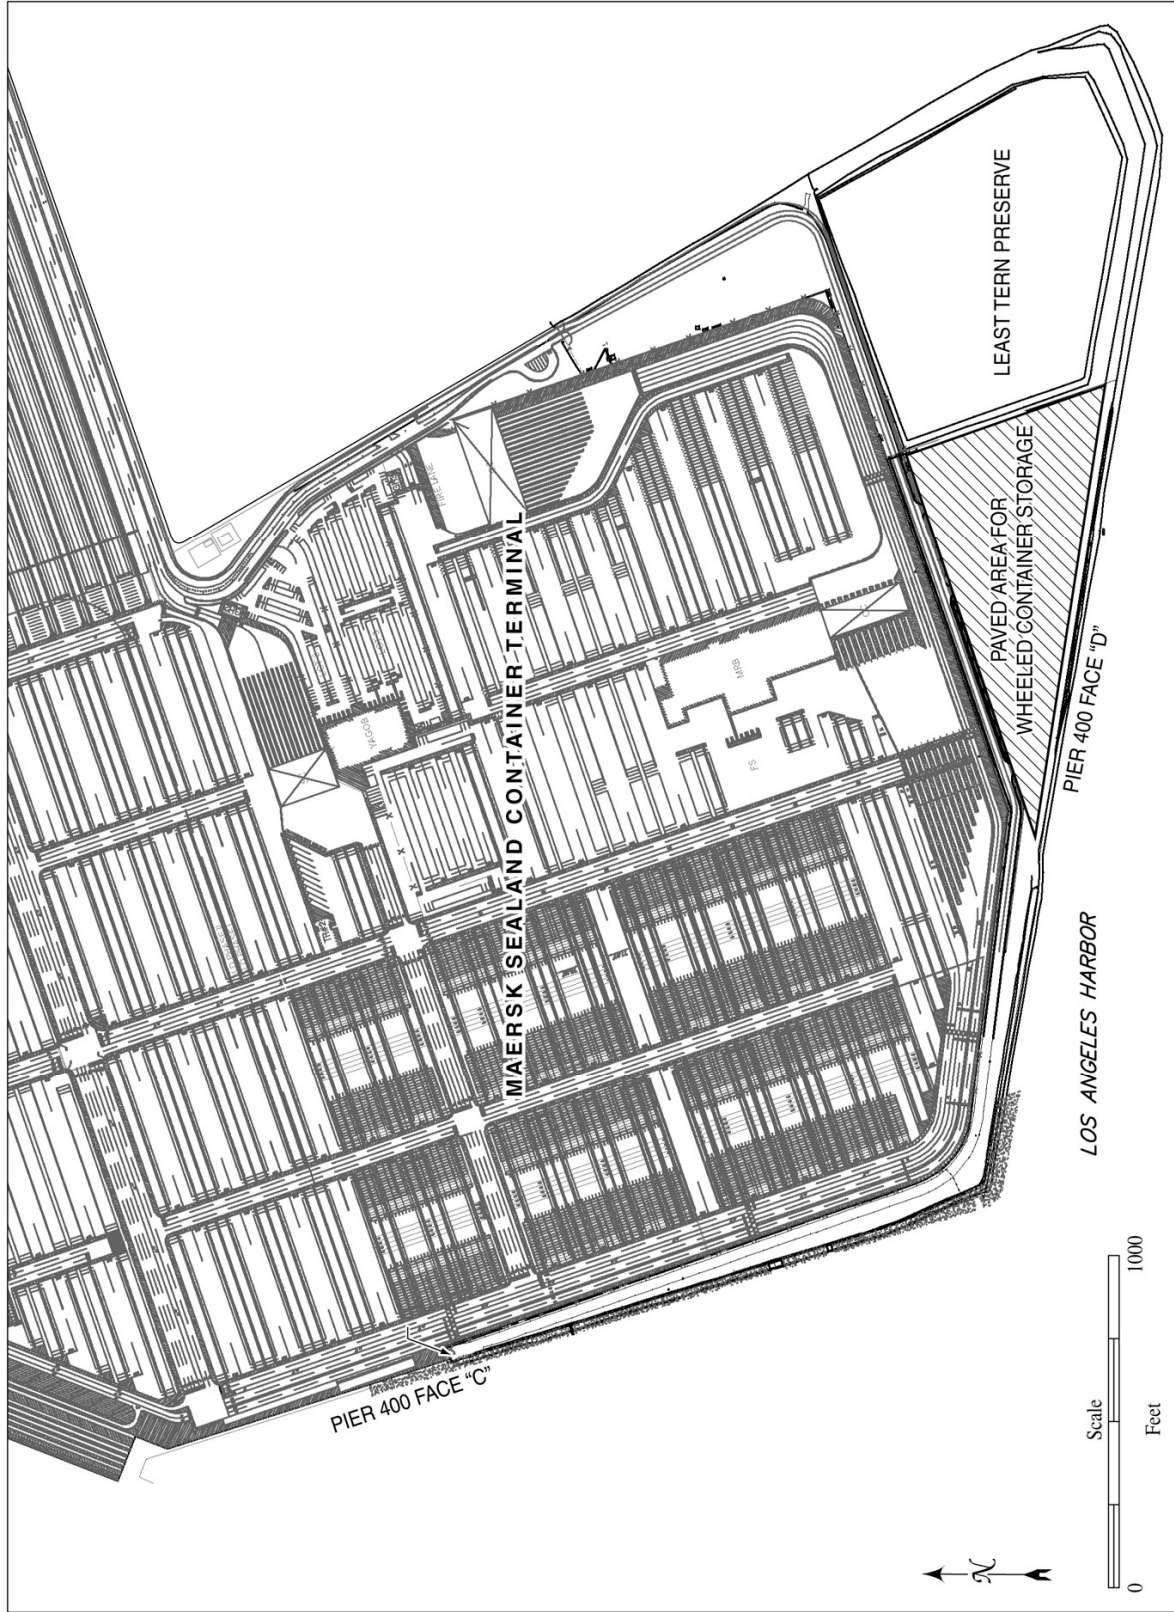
Temporary Container Terminal Storage at Pier 400 Under No Federal Action/No Project Alternative
